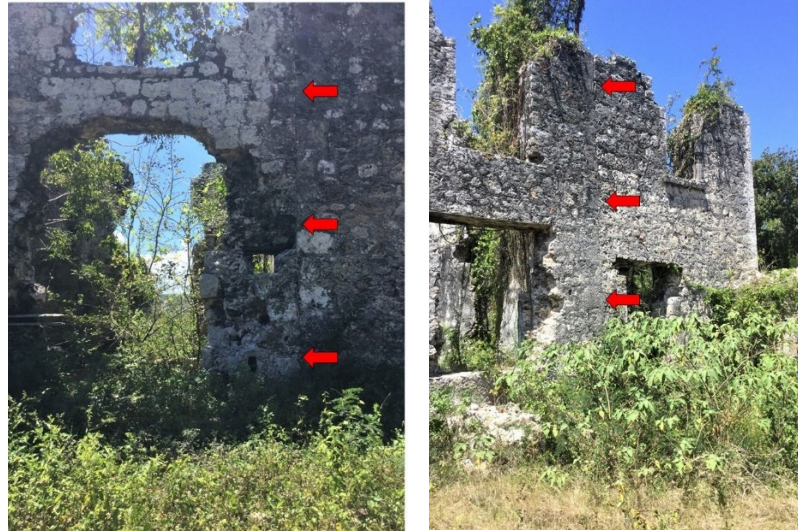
Seam #3 (left) and Seam #4 (right) located on northern and eastern exterior walls of Great House.
